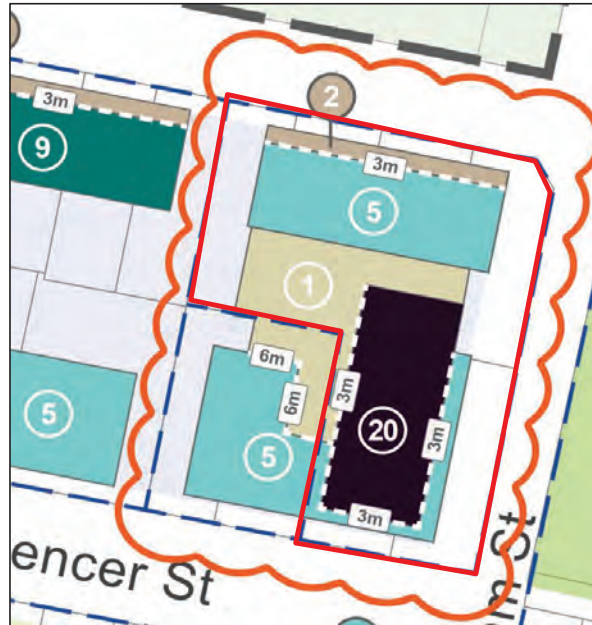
Revised DCP – Building Envelopes Plan (site highlighted in red)
